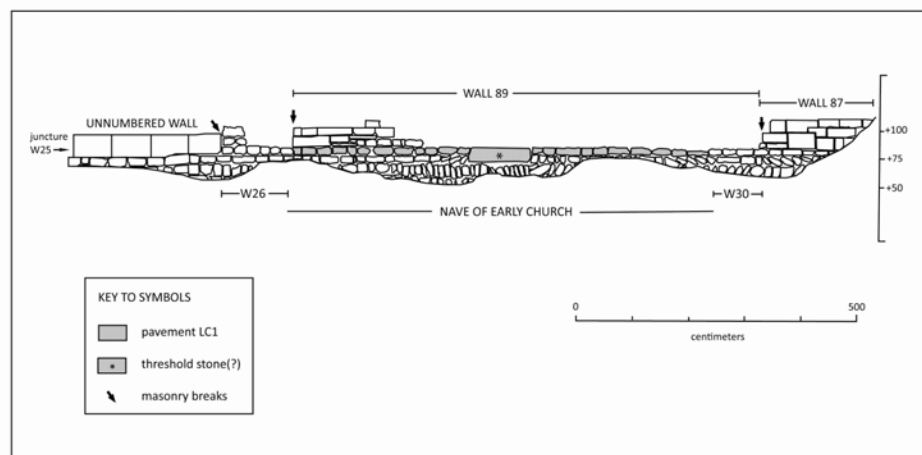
Elevation drawing of the west face of the closing walls 89 & 87.
